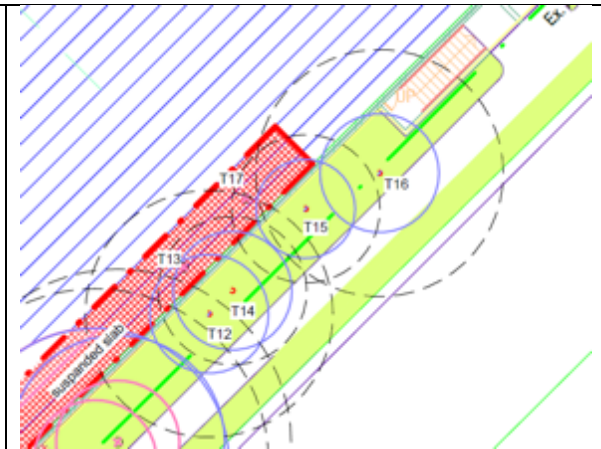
Level 0 Plan - Tree 14 Showing roof space, suspended slab (couter level)
